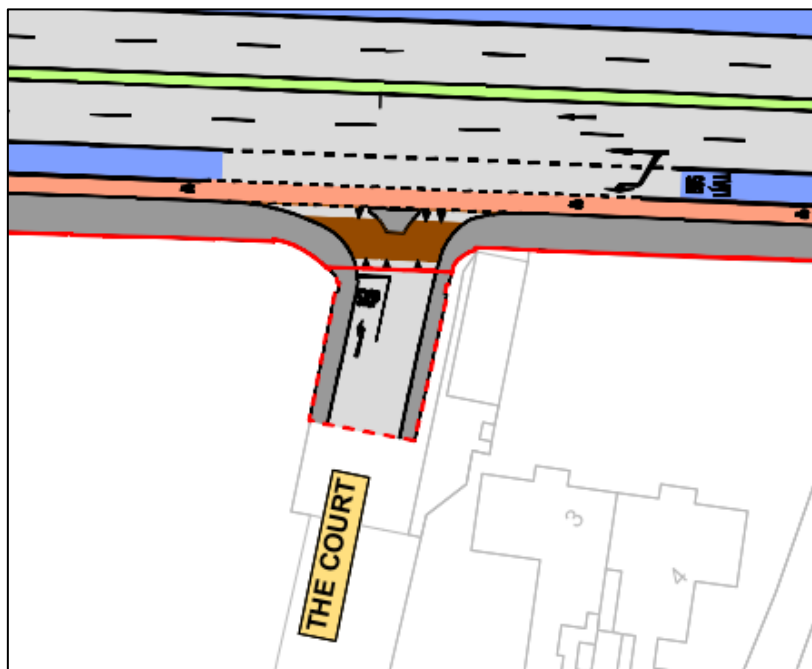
Extract from General Arrangement Drawing (Sheet 009)
